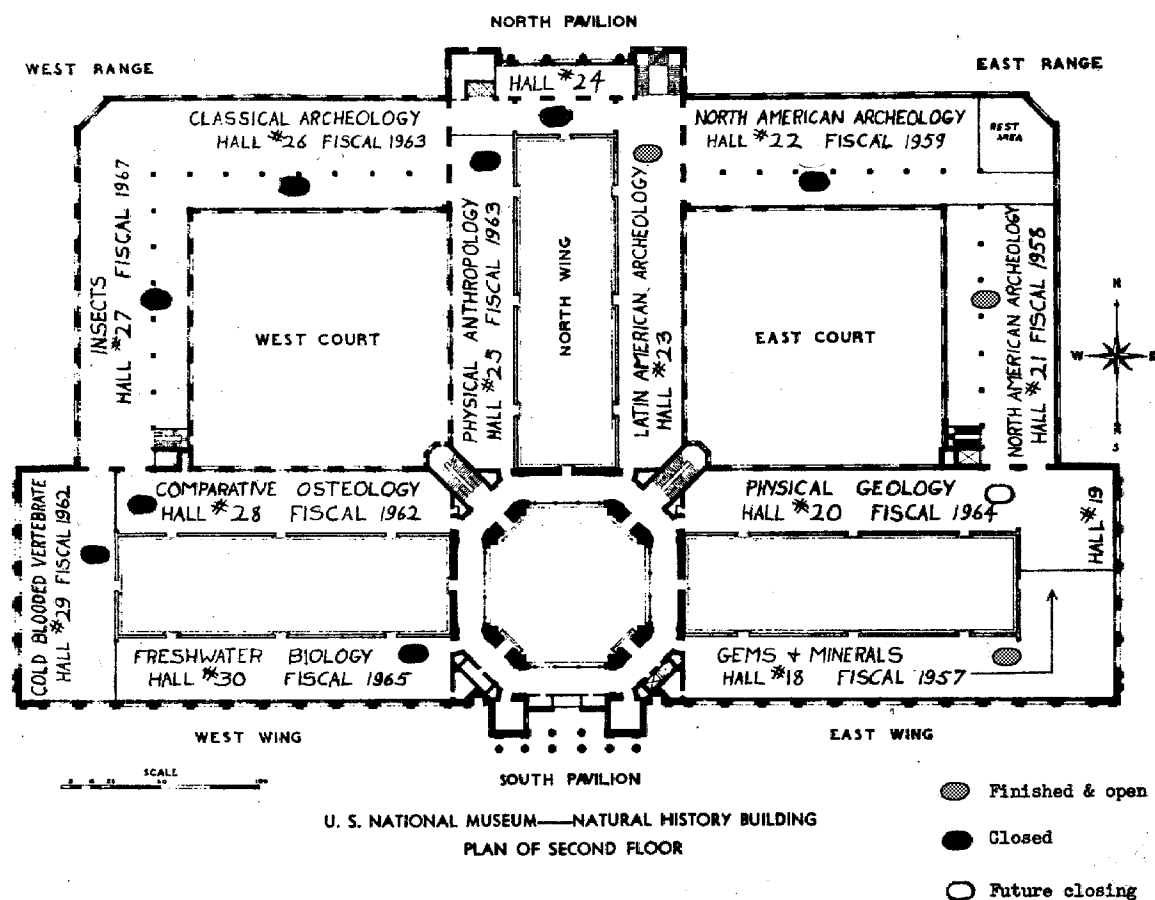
Floor plan of second floor of the Natural History Building, 1961. The Hall of Plant Life was originally slated for Hall 26 (upper left). SIA RU 155, Box 10, courtesy the Smithsonian Institution.
